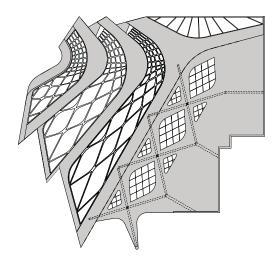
Preliminary roof plan (NTS), problems encountered include geometry of roof patterns not refined, and east side of roof is conflicting with adjacent roof.
